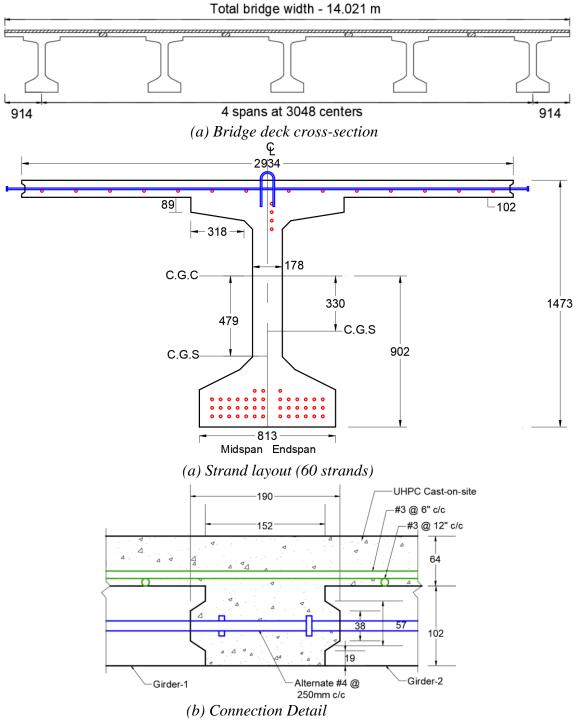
Strand layout and connection detail for Design 4: 5-Tx54-UHPC-Girders with 4-inch wide flange, 2.5-inch site-cast UHPC-topping with slab reinforcement
